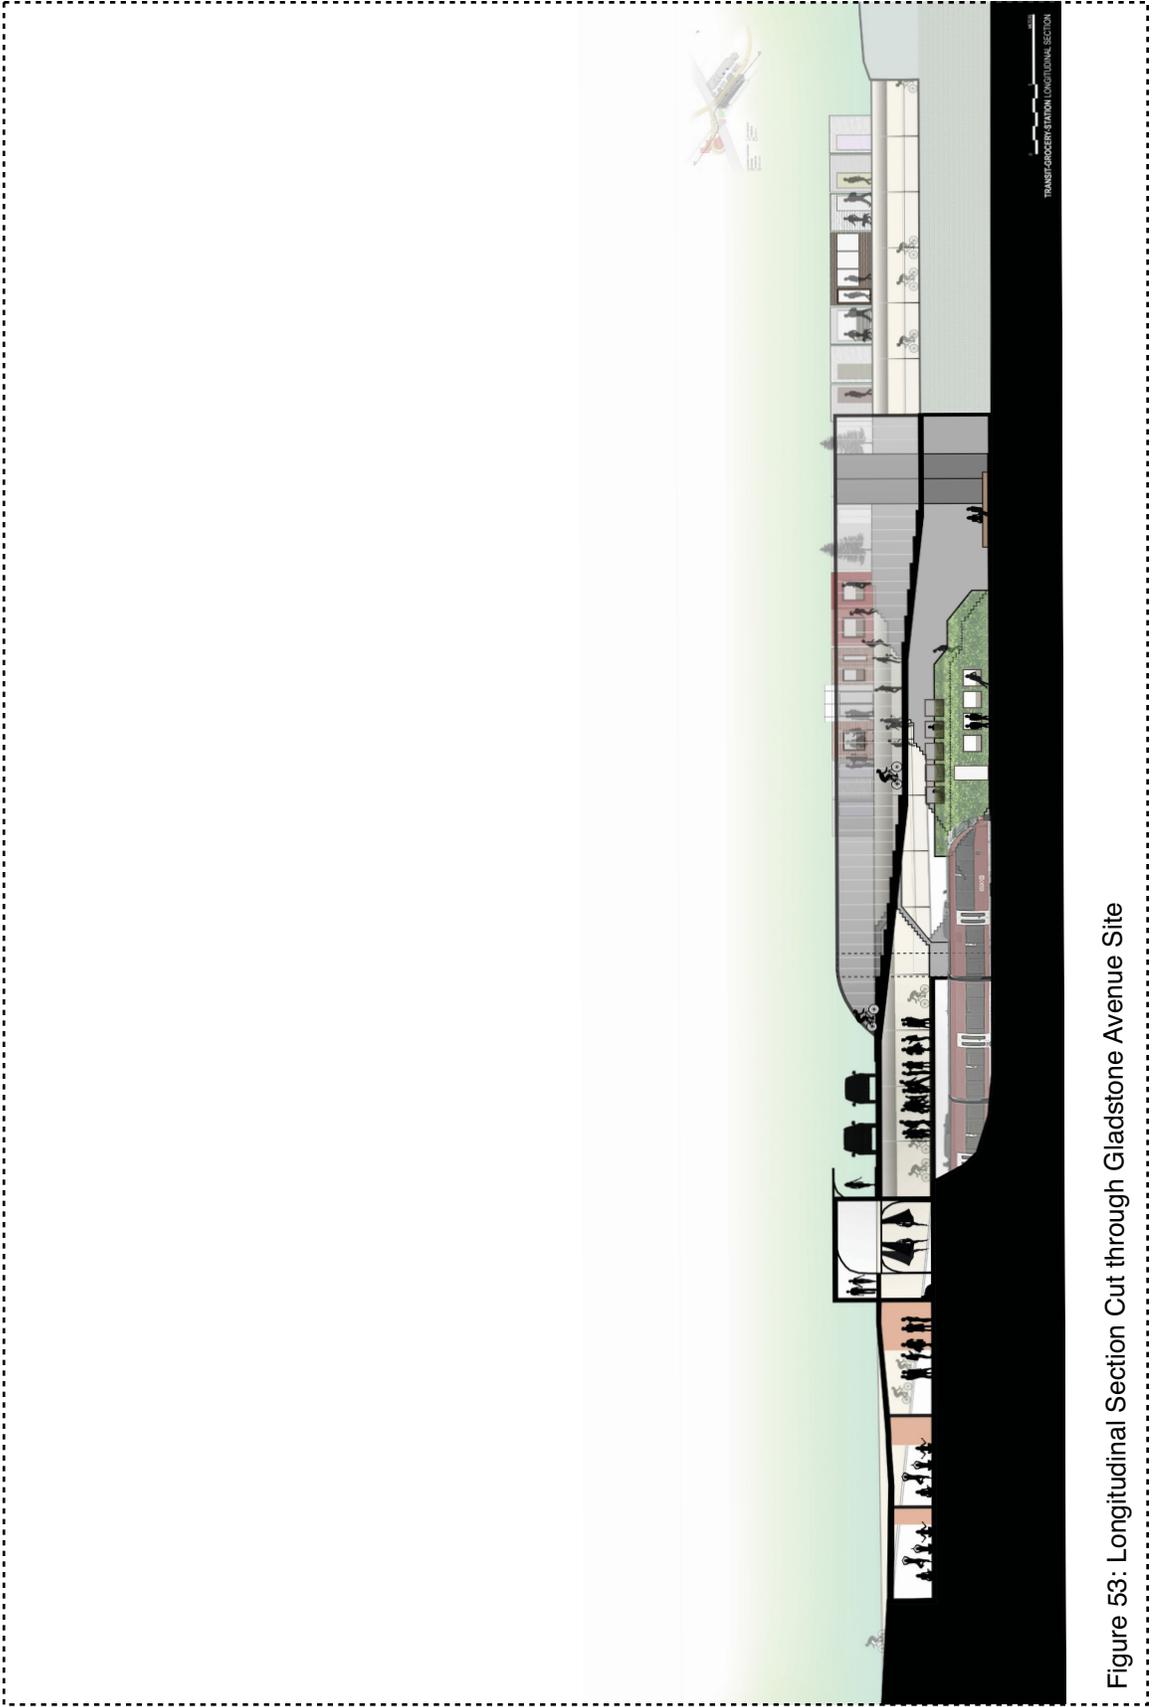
Longitudinal Section Cut through Gladstone Avenue Site
